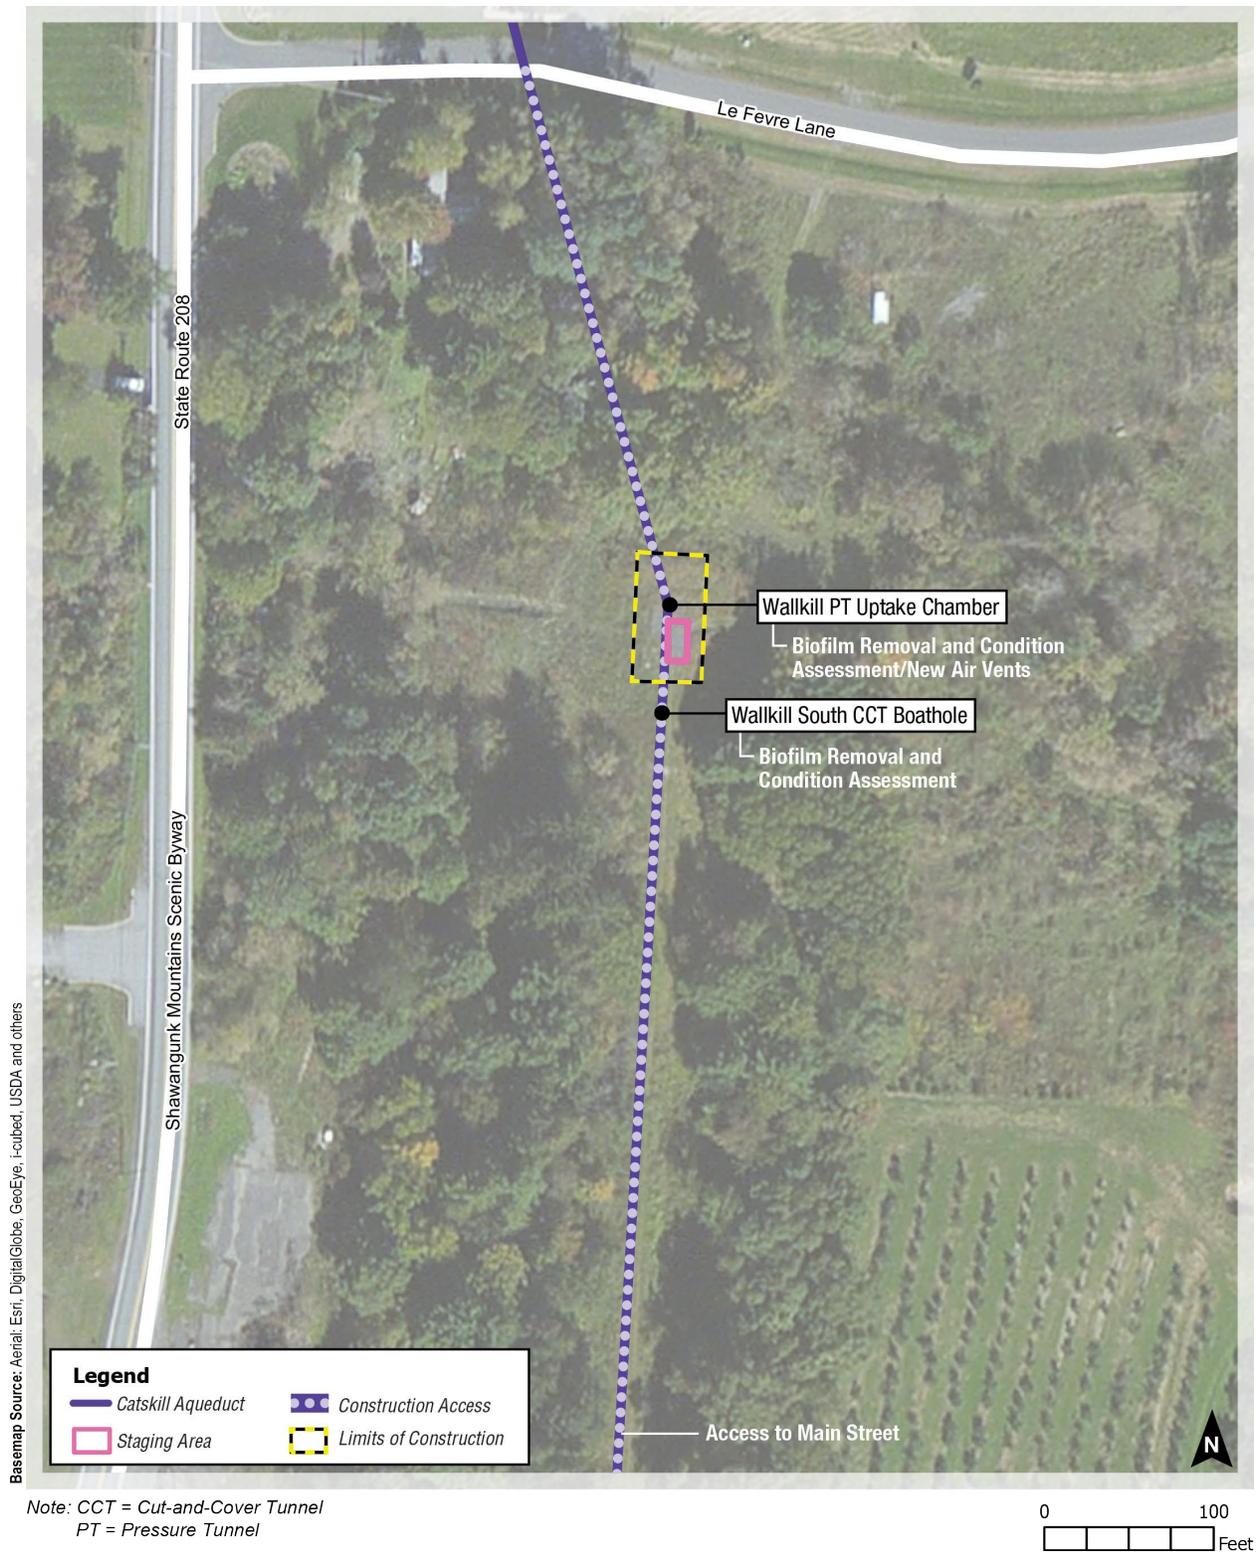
Site Plan – Le Fevre Lane Study Area
